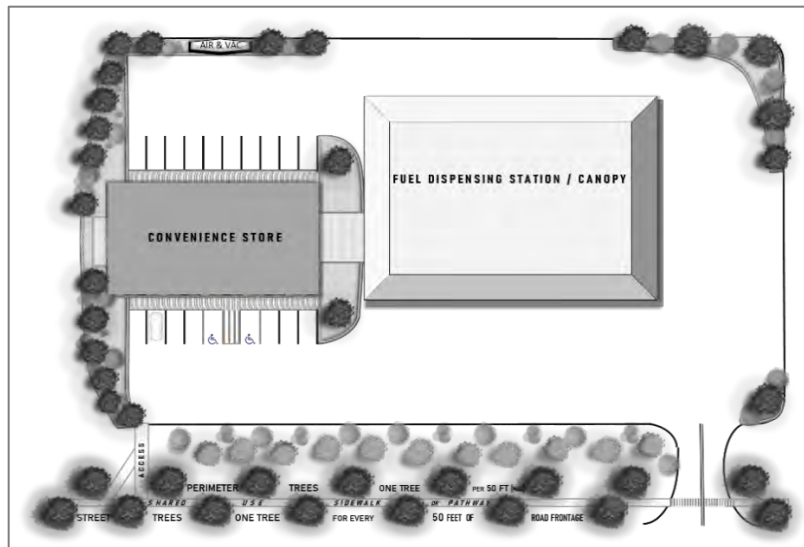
Example of fuel dispensing station/canopy/parking area layout.
